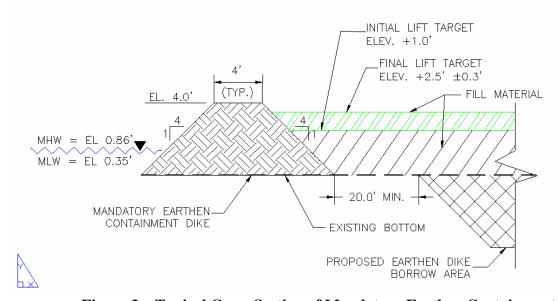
Typical Cross Section of Mandatory Earthen Containment Dikes
